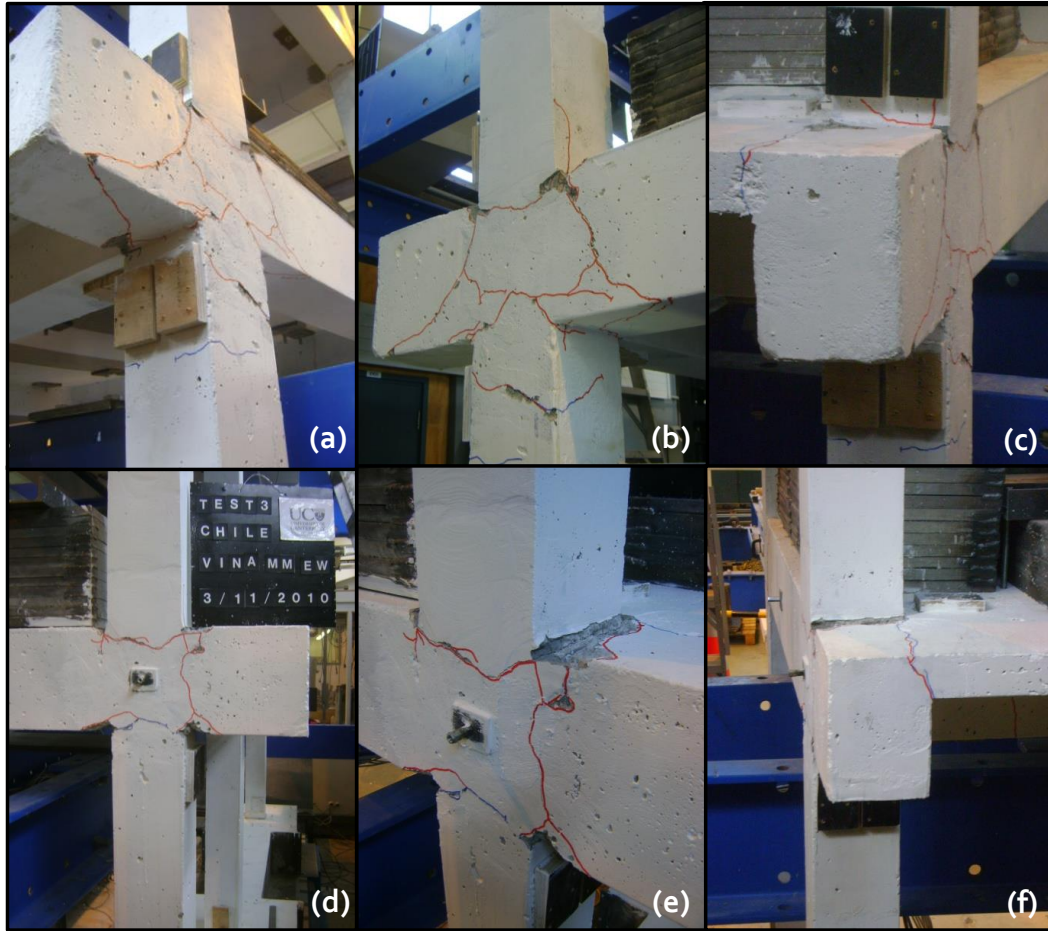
Observed damage in first floor exterior joints of the internal frame: (a) long span joint 3D view, (b) long span joint side view, (c) long span joint front view, (d) short span joint side view, (e) short span joint close-up, (f) short span front view.
